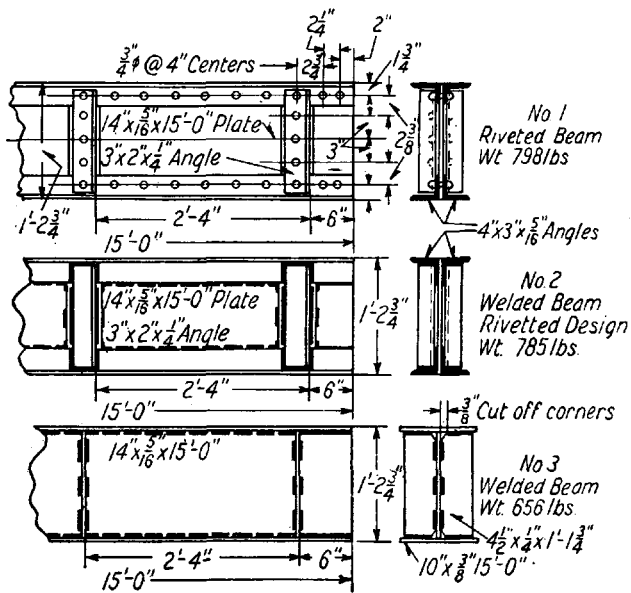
Three equivalent beams illustrating the advantage of welded design over the riveted.
